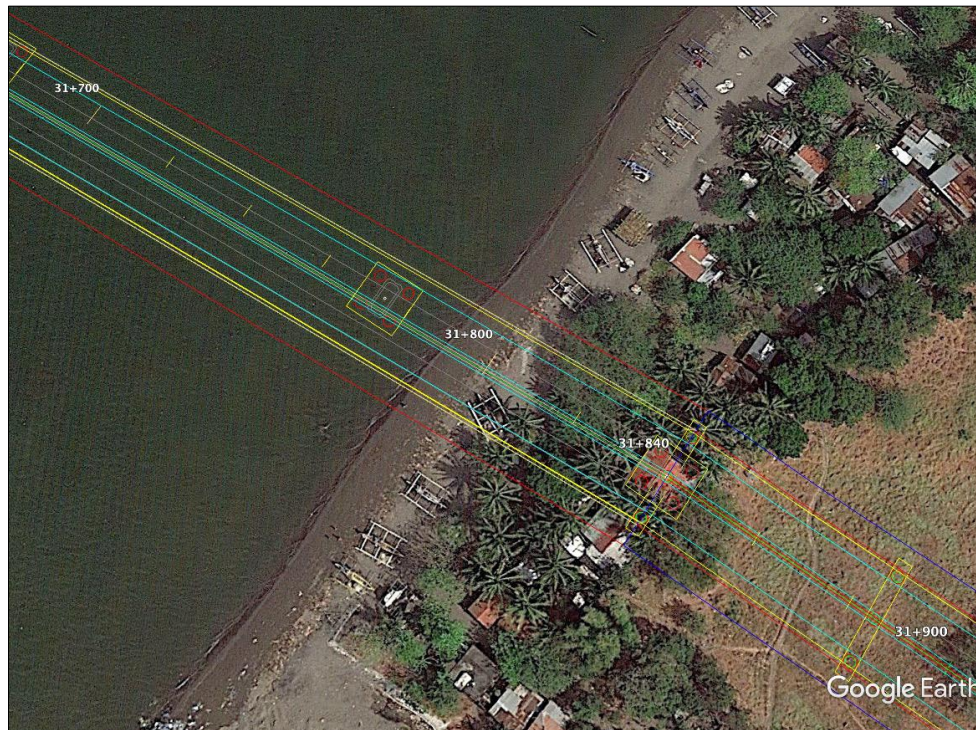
Placement of Alignment and Footings BCIB Landing Site, Naic
